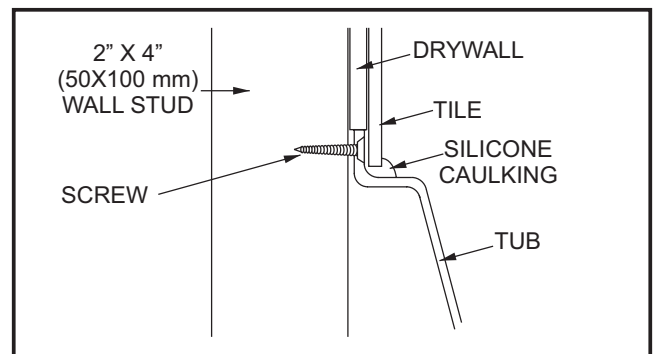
WALL INSTALLATION FOR TUBS WITH TILE FLANGE
